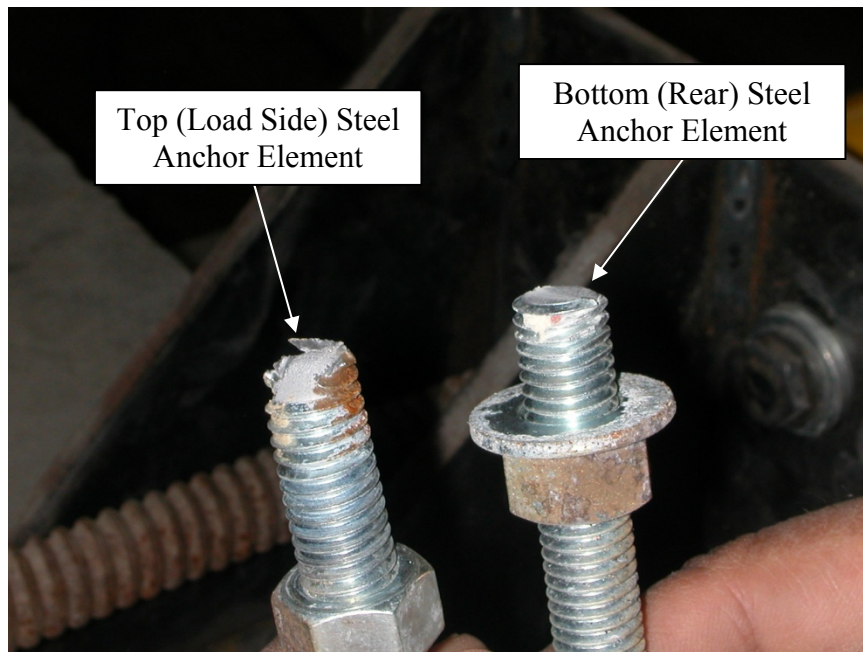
Comparison of Top (Load Side) and Bottom (Rear) Steel Anchor Element Failures of Test Group B
